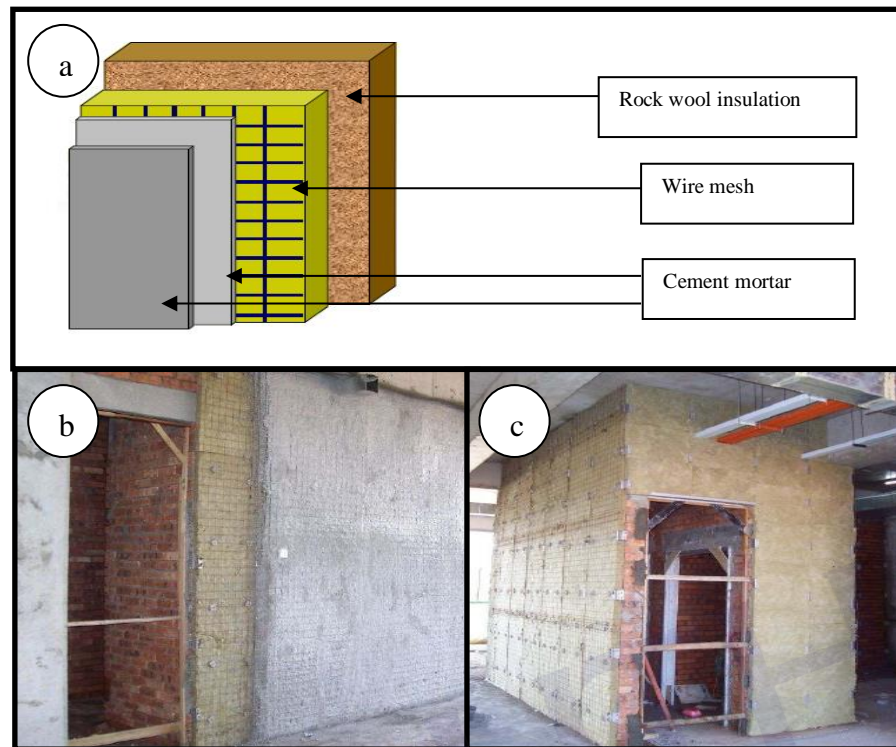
(a) Office building internal wall (b) & (c) Internal wall installed with insulation system during construction of the building
